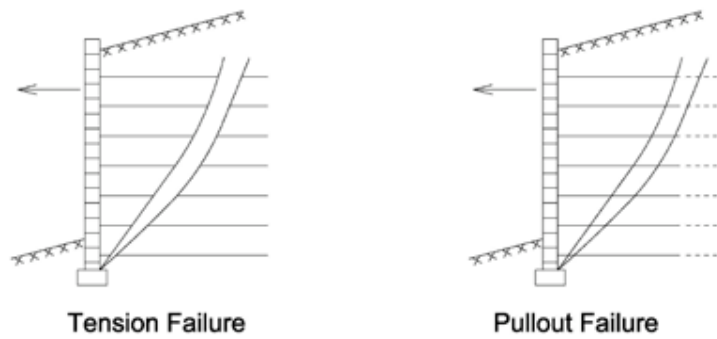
Internal Stability Failure of MSE Walls
